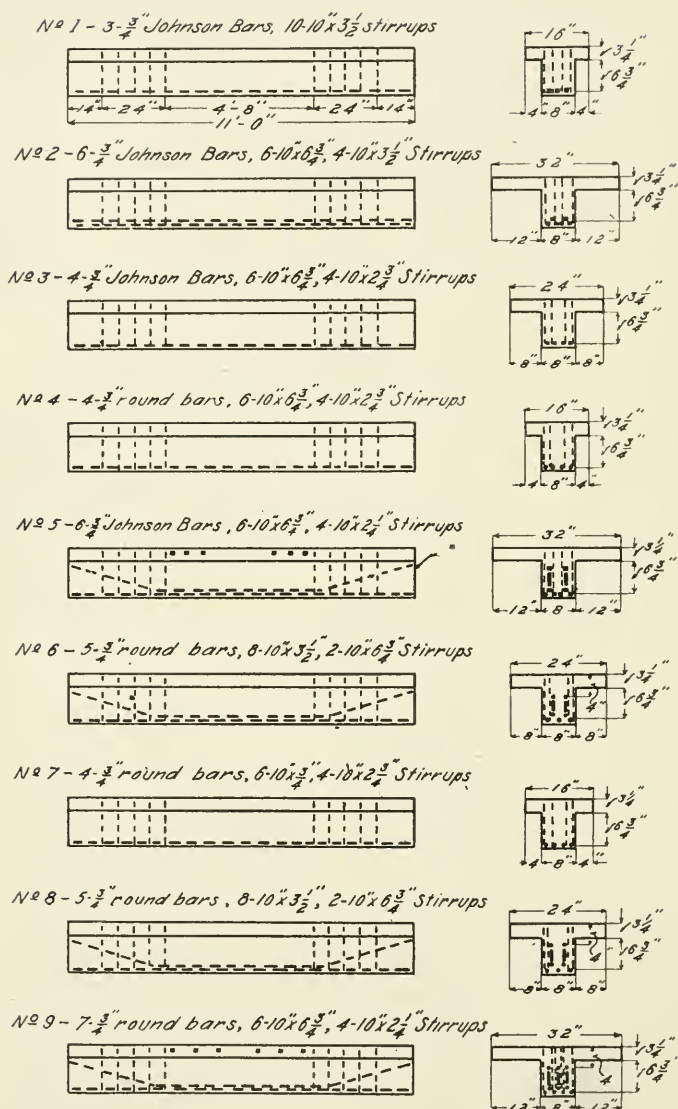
ARRANGEMENT OF REINFORCEMENT.
